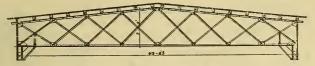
LATTICE TYPE OF ROOF TRUSS.
